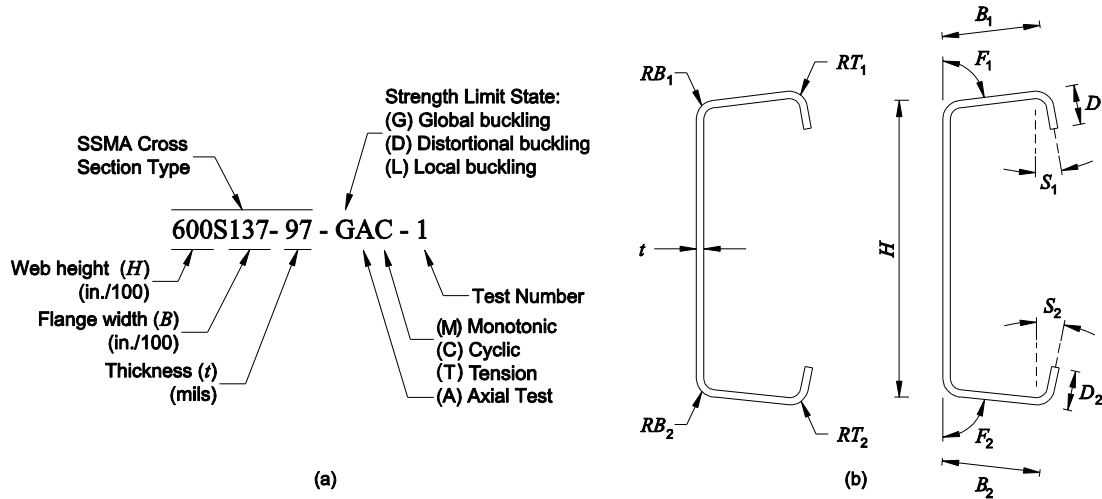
Specimen naming notation (a); and cross-section dimension (b).
